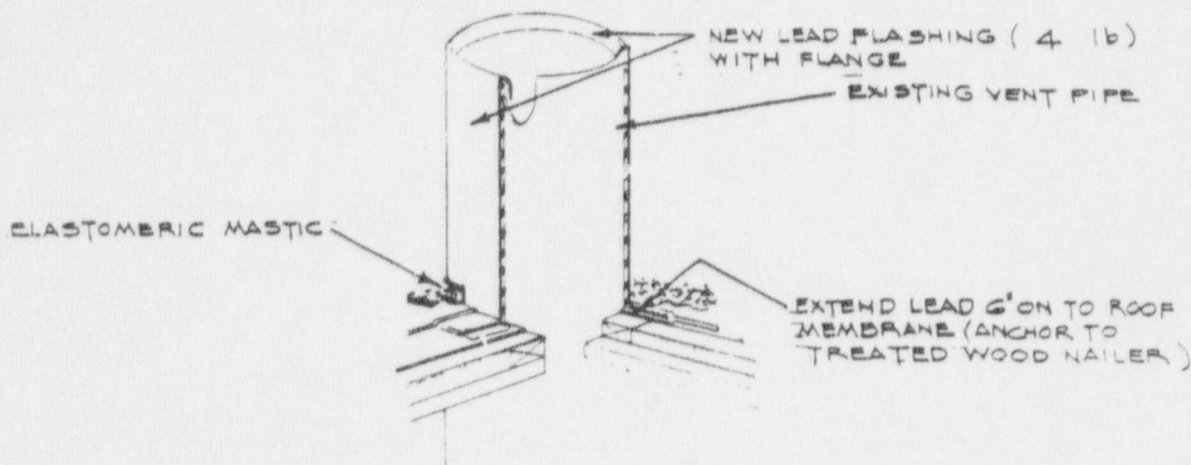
DEPARTMENT OF THE NAVY NAVAL FACILITIES ENGINEERING COMMAND
